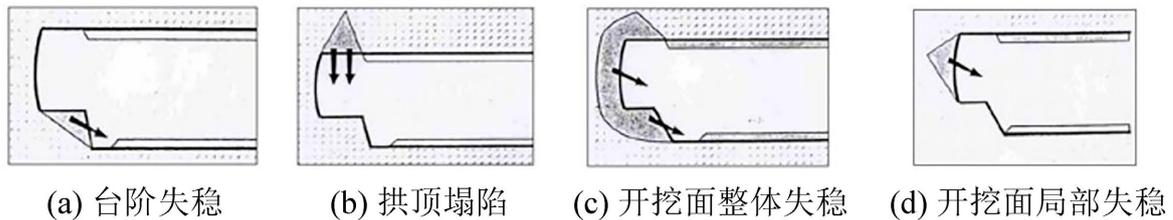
Failure model of clay tunnel excavation in London [28]
